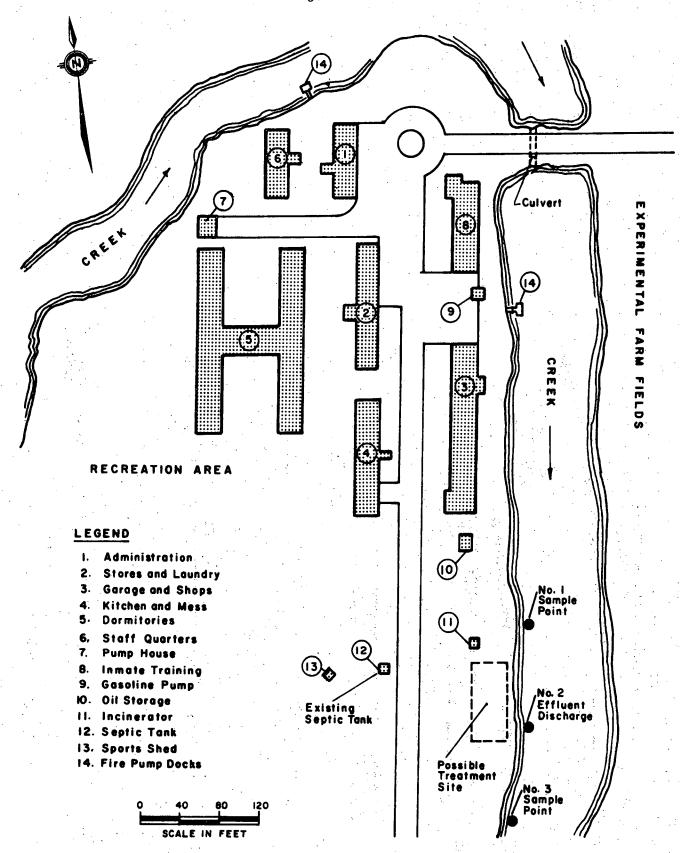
AGASSIZ CORRECTIONAL WORK CAMP - SITE PLAN
